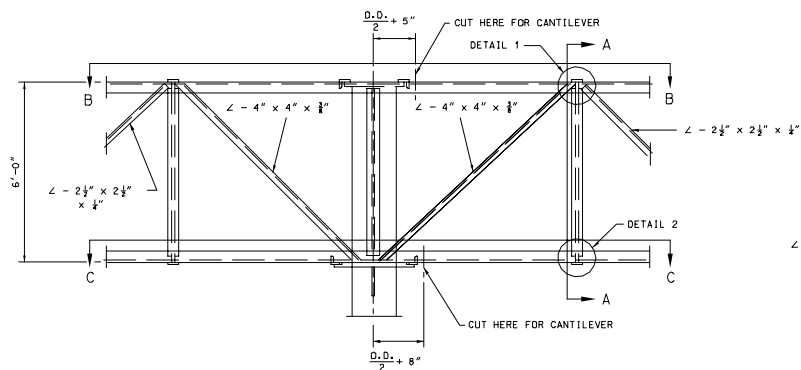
DETAILS OF BUTTERFLY AND CANTILEVER TRUSS
